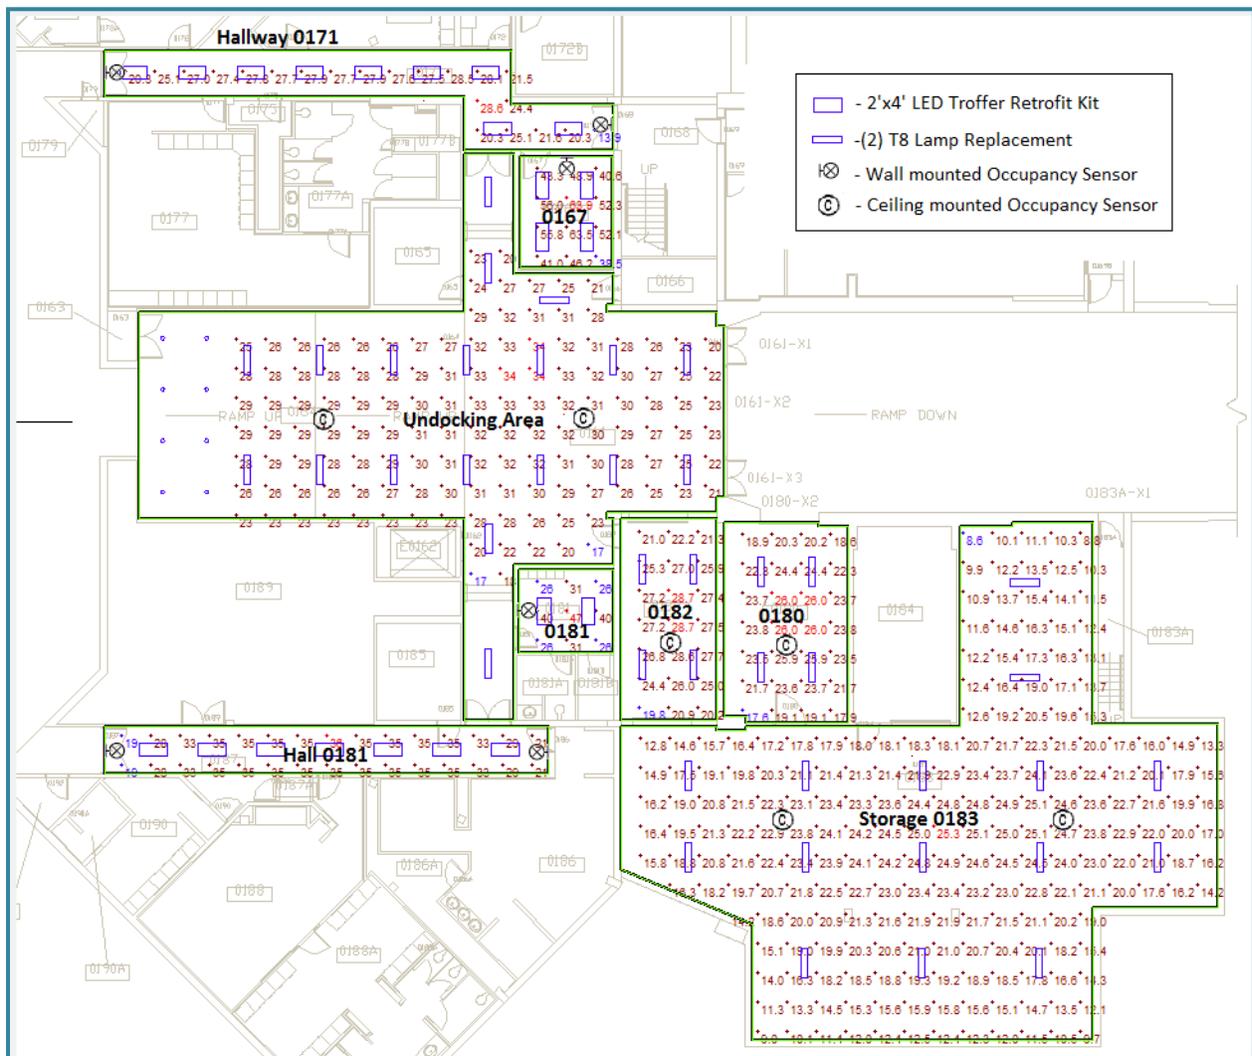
Proposed Lower Level Reflected Ceiling Plan
